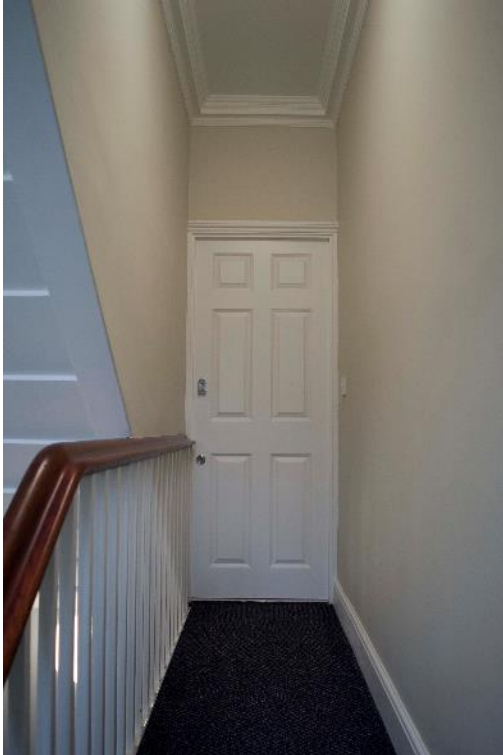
Station, Range 1, detail of plastered first floor stairwell ceiling, facing north-west (170859_0007)
